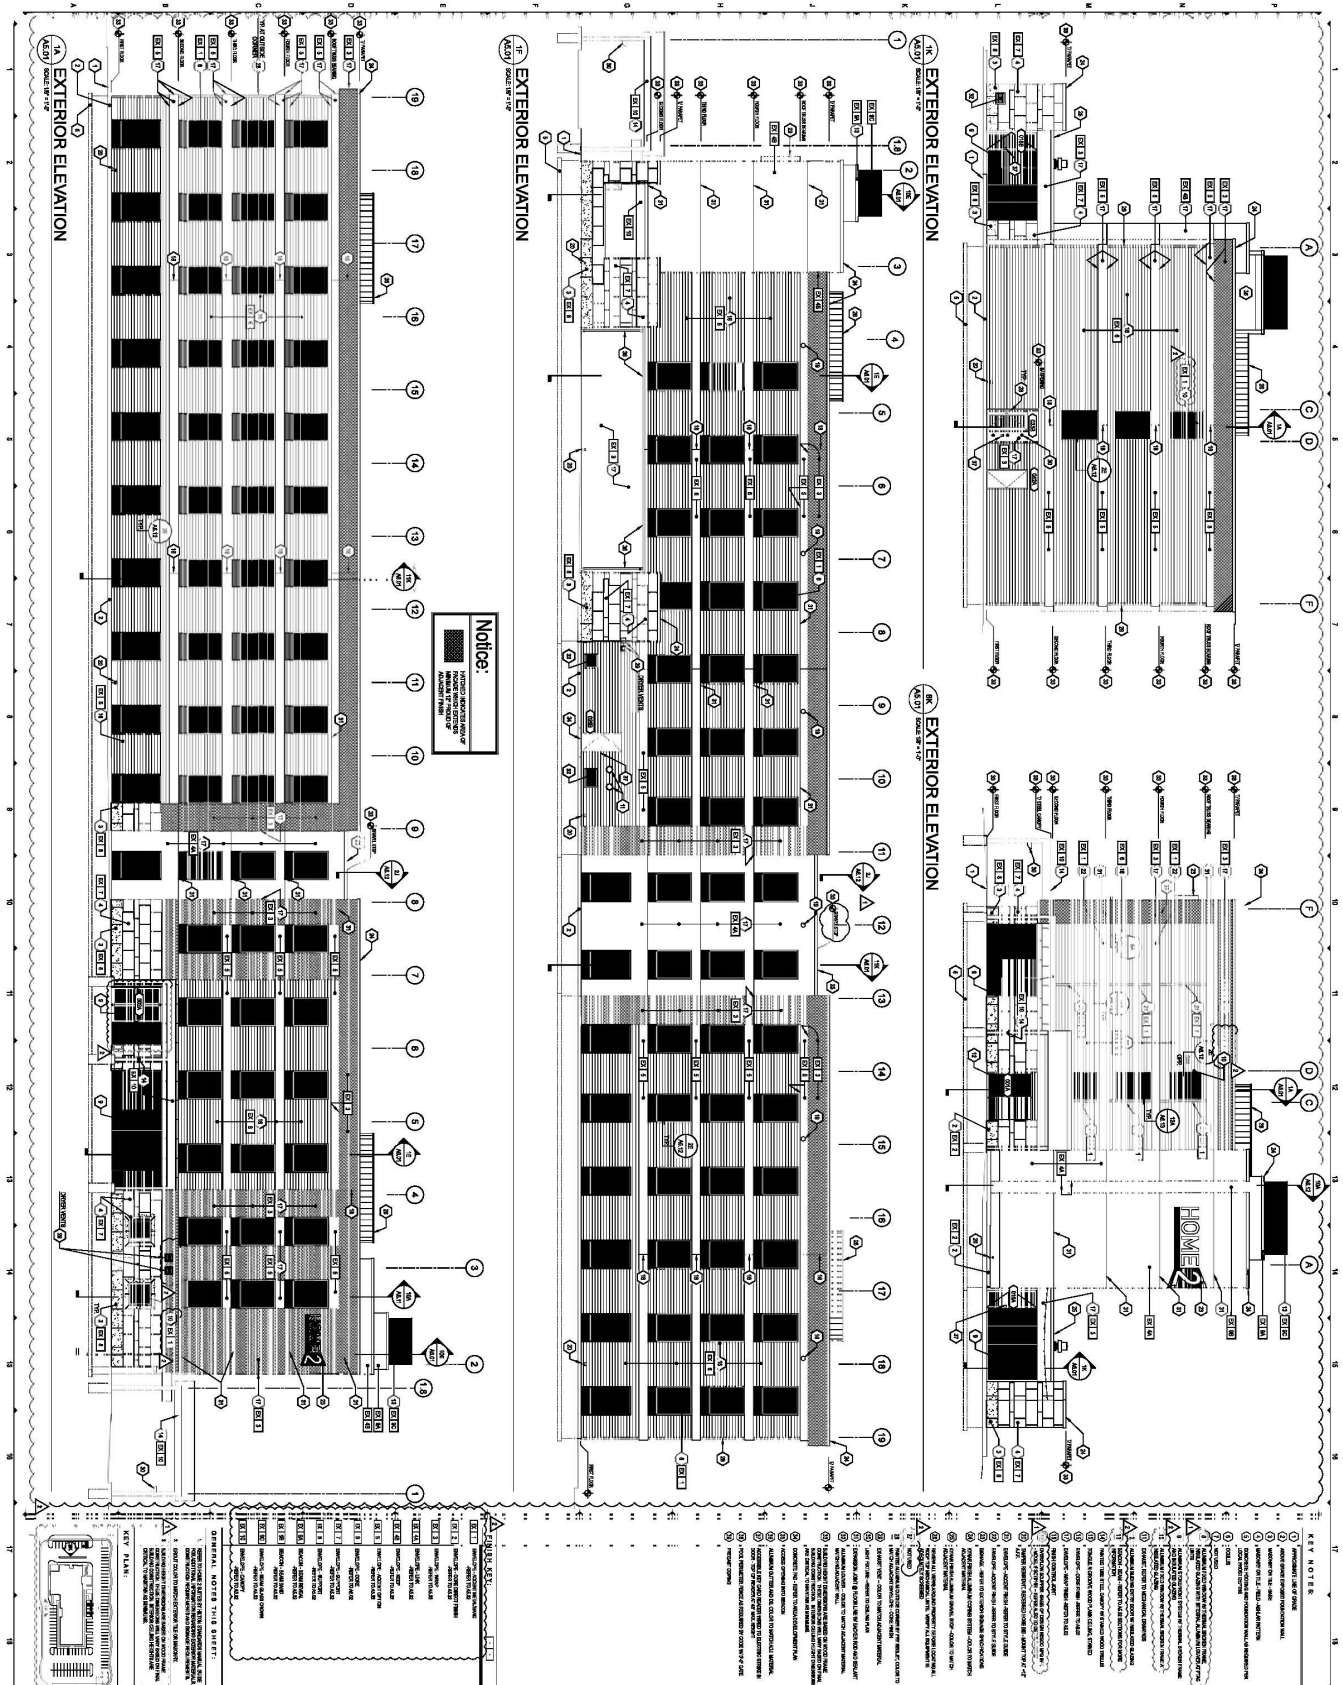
EXHIBIT C: EXTERIOR ELEVATION (HOME2 SUITES)
